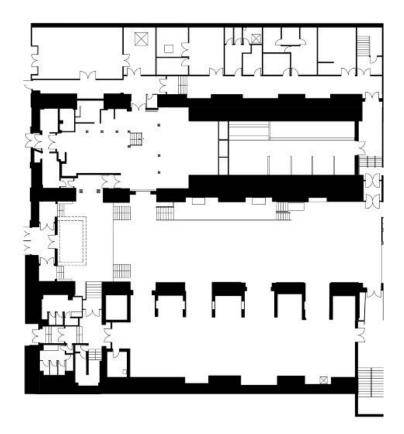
Floor Plan focus area of the ground floor of Heaven Nightclub London (Buenavista Architecture, n.d.)
